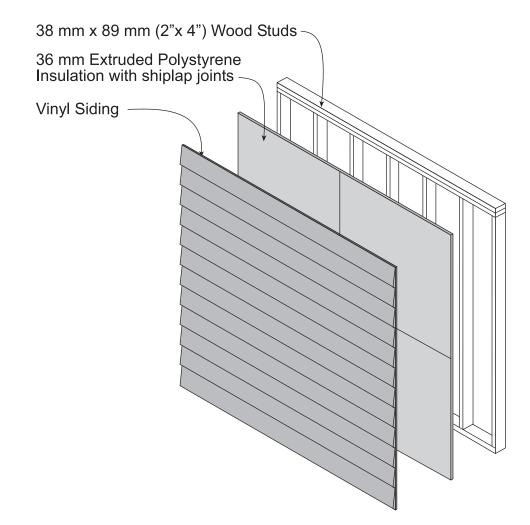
Composition of vinyl siding wall specimen No. 17
